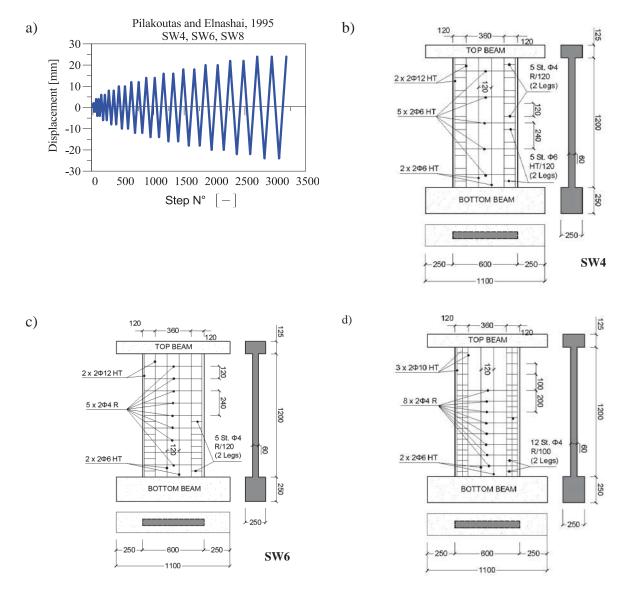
Loading history for SW4, SW6, SW8 (A); geometry and reinforcement details of walls SW4 (b), SW8 (c) and SW8 (d) [Pilakoutas and Elnashai, 1995].
